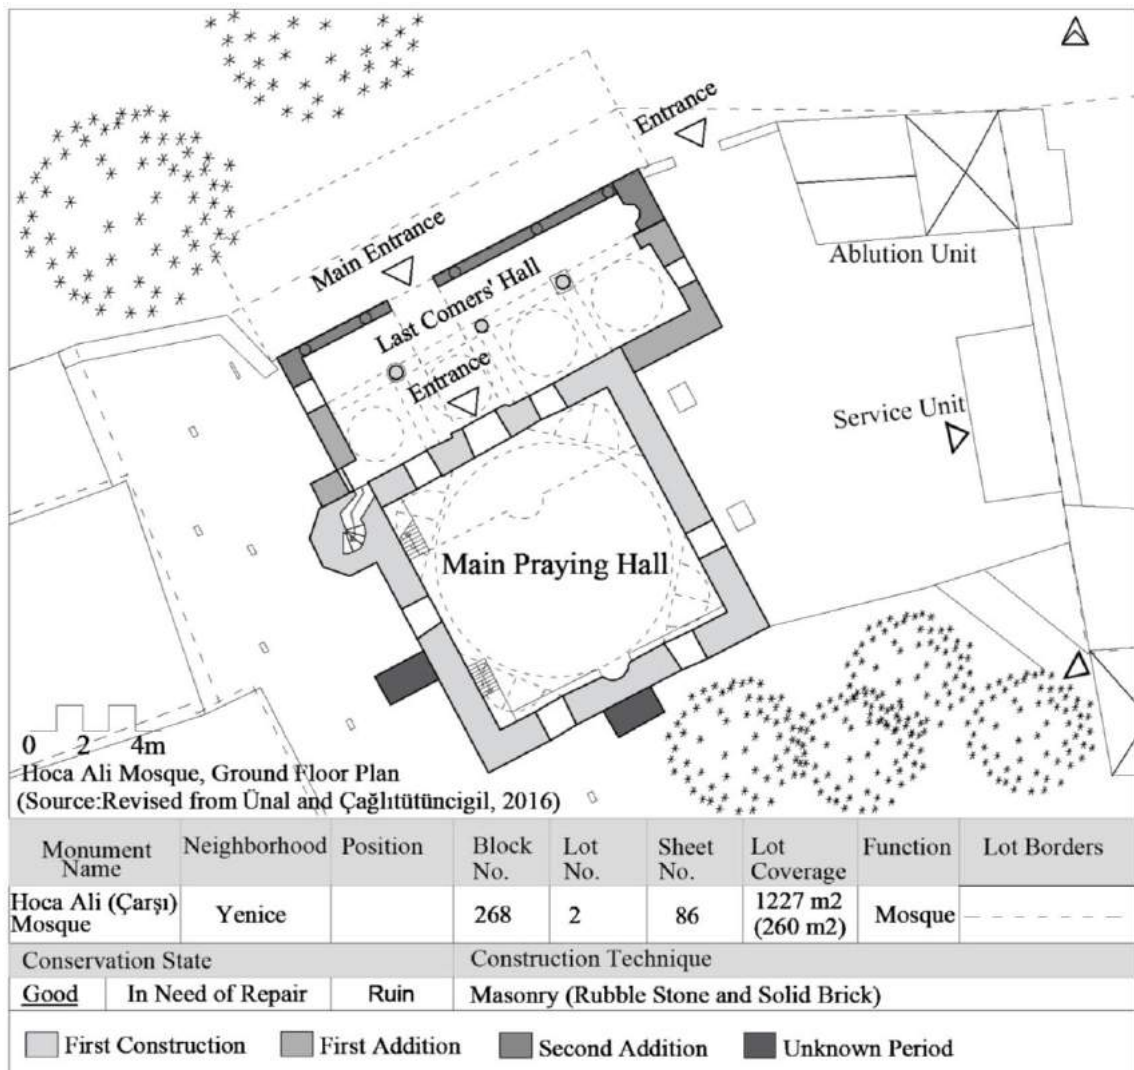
Ground Floor Plan, Hoca Ali Mosque
